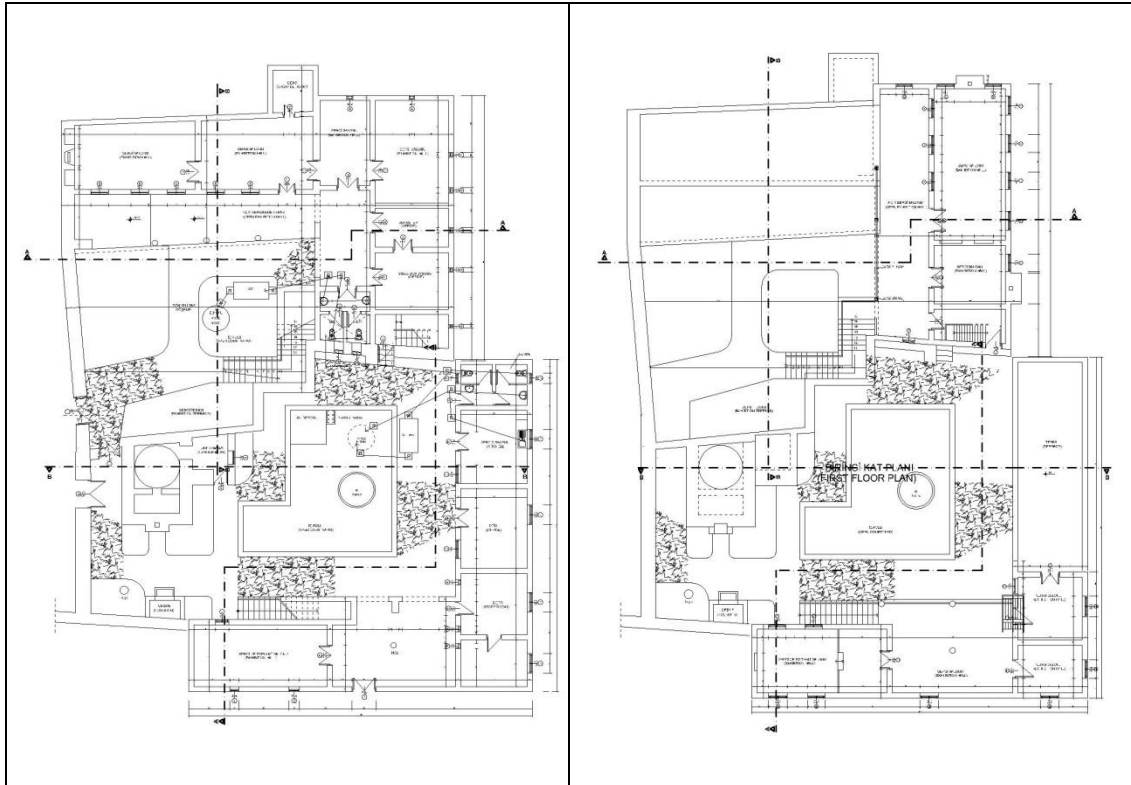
Floor plan of the chimney House with the ground floor plan on the left and first floor plan right side; (Department of Antiques and Museums)
